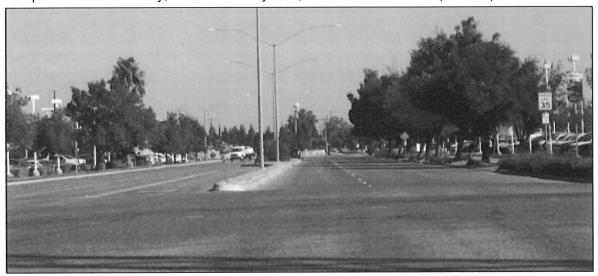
Naglee Road (looking north) at Robertson Road (Lum, 9/16/22)
